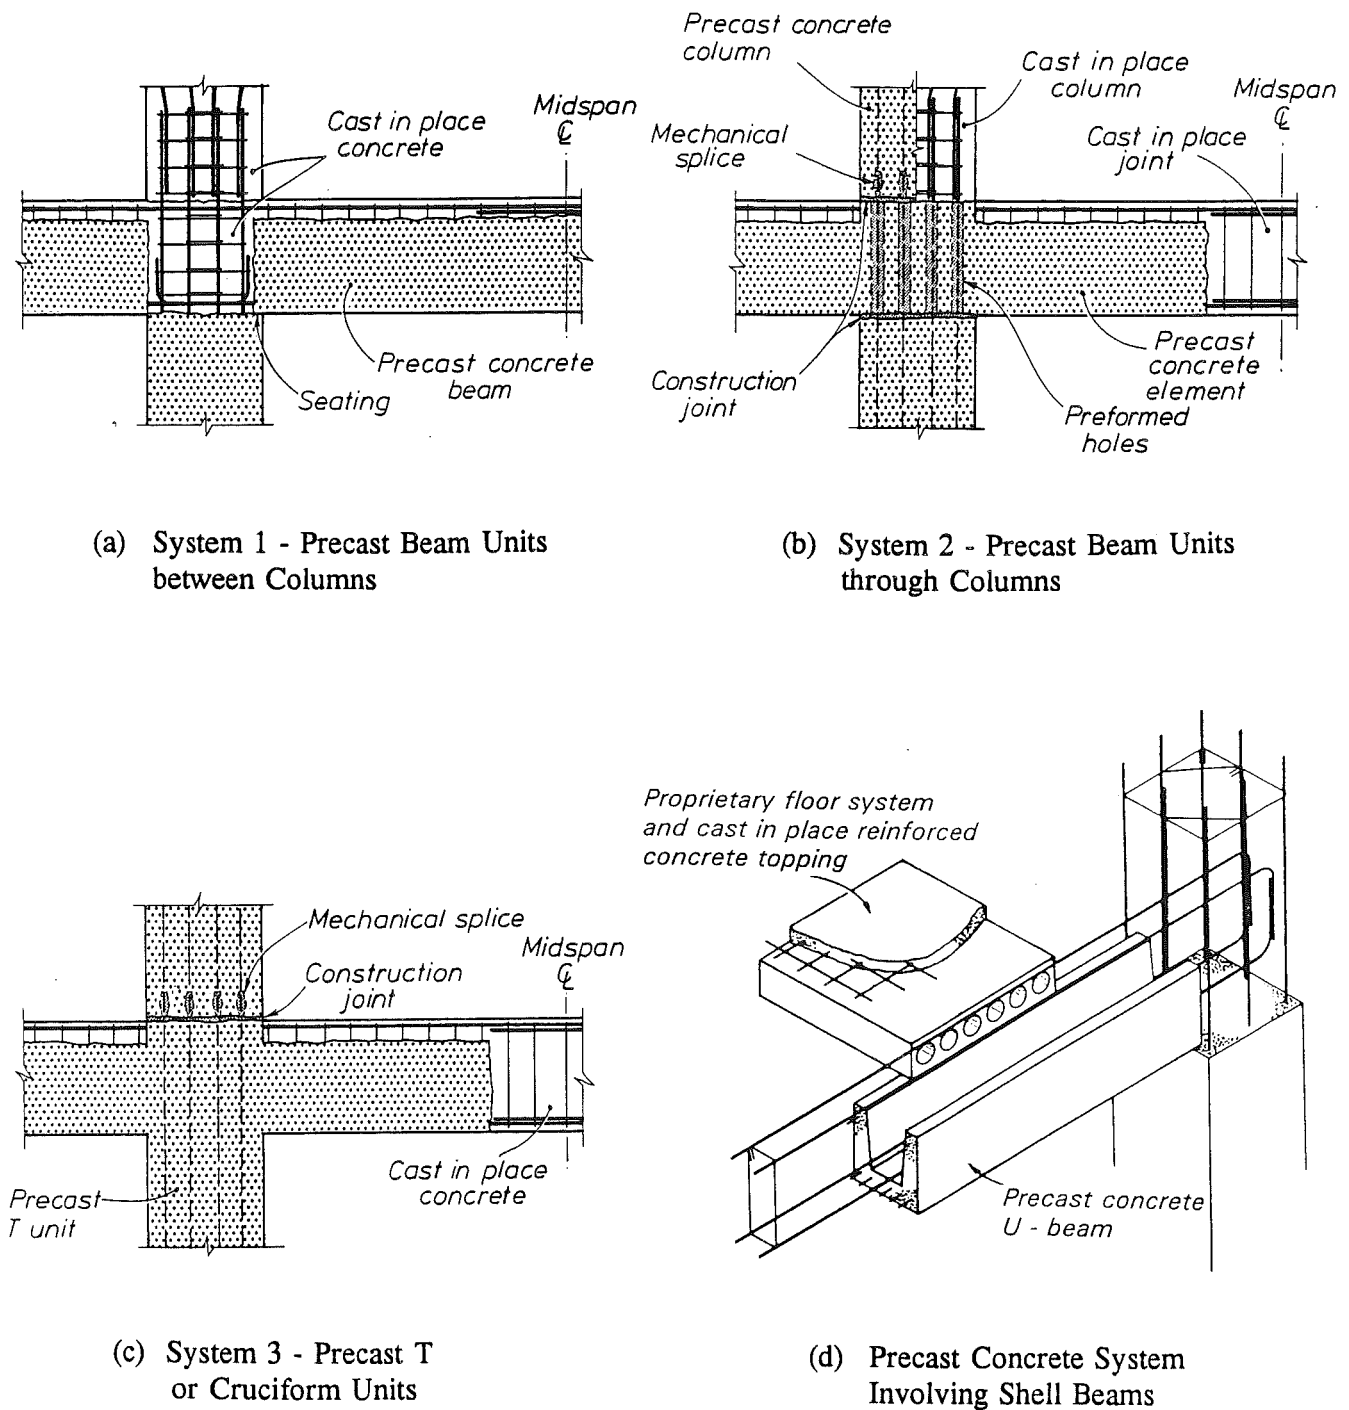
Commonly Used Arrangements of Precast Members and Cast in Place Concrete for Constructing Moment Resisting Reinforced Concrete Frames in New Zealand.
